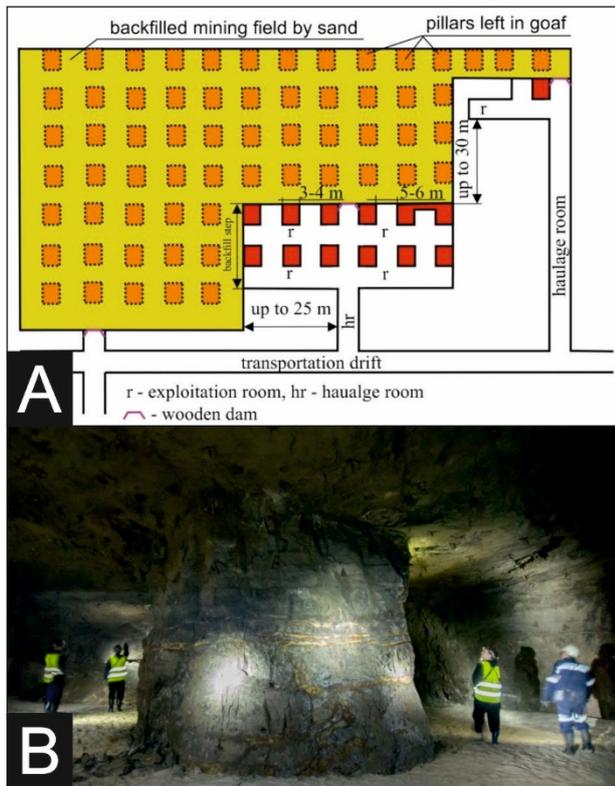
Hydraulic backfilling in the Zinc and Lead „Olkusz-Pomorzany” Mine; A) top view of scheme of room and pillar mining system of exploitation; B) view of the system with visible sand from the first layer on the floor of the excavation.
